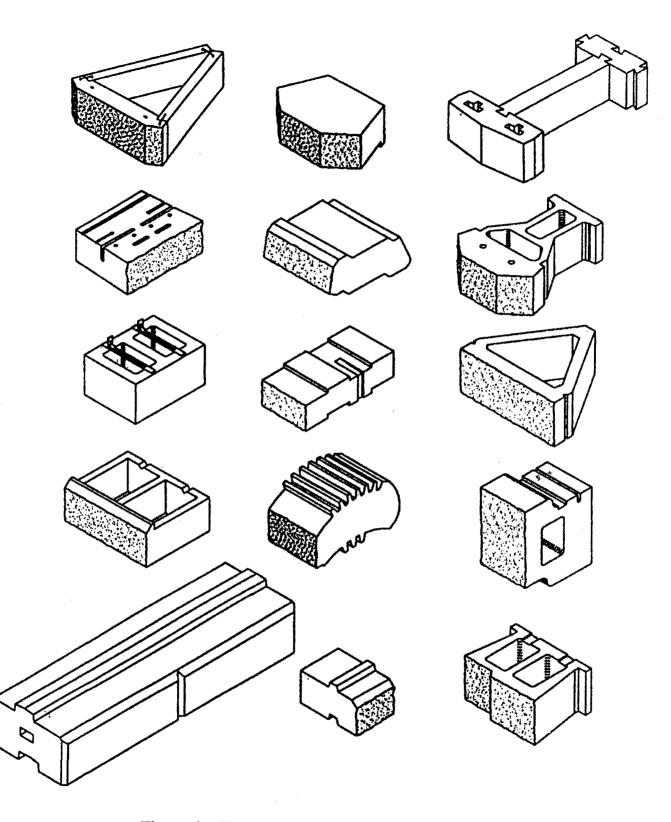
Examples of commercially available MBW units (from Design Manual for Segmental Retaining Walls).
